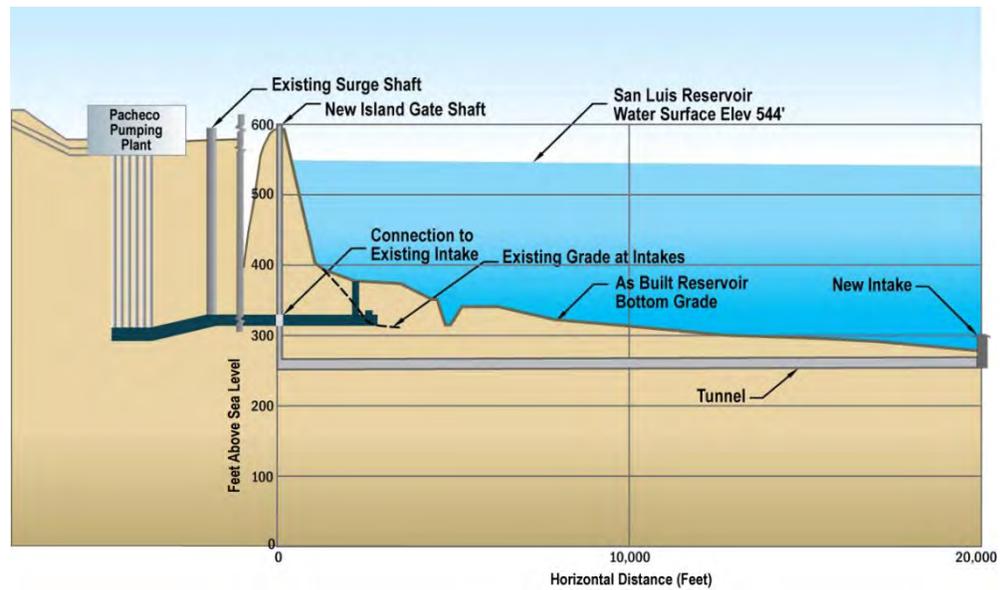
Lower San Felipe Intake Alternative Plan Tunnel Profile
